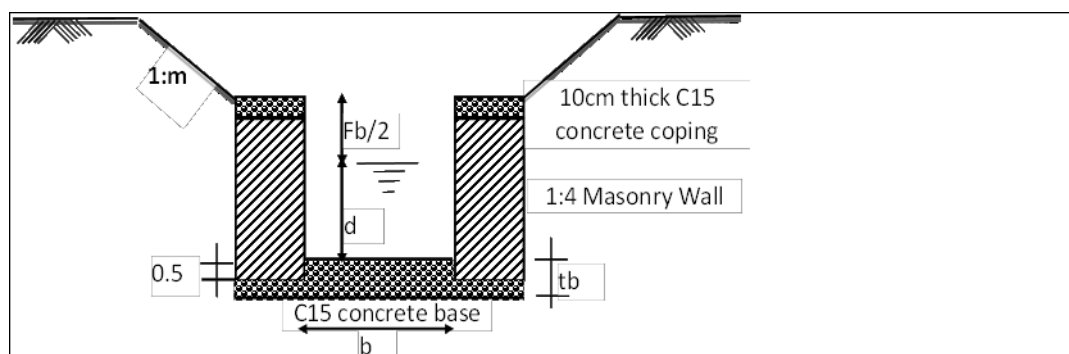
Lining thickness for rectangular canal section (Type-B, on SC & Others)
